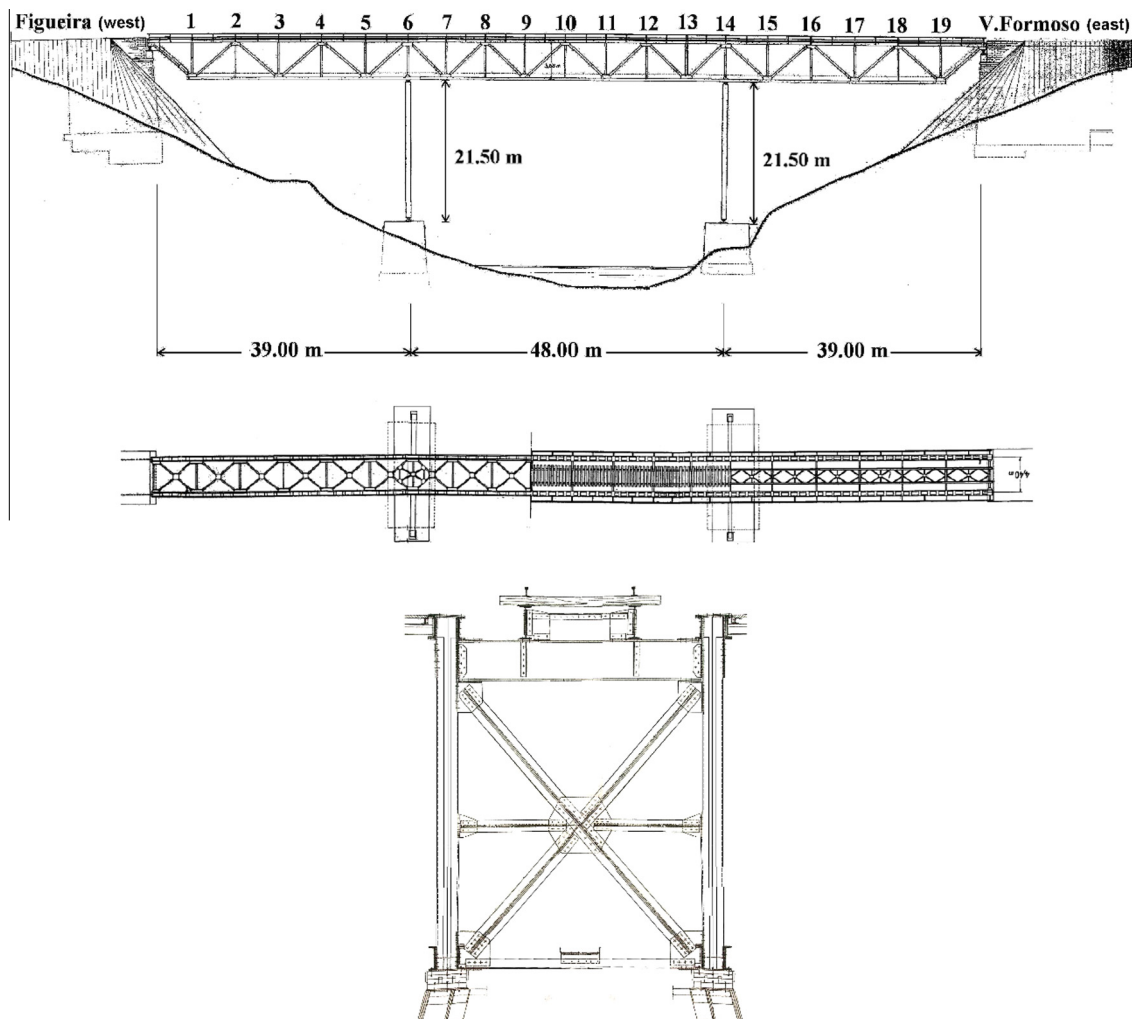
Elevation, plan view and cross section of the Trezói Bridge.
